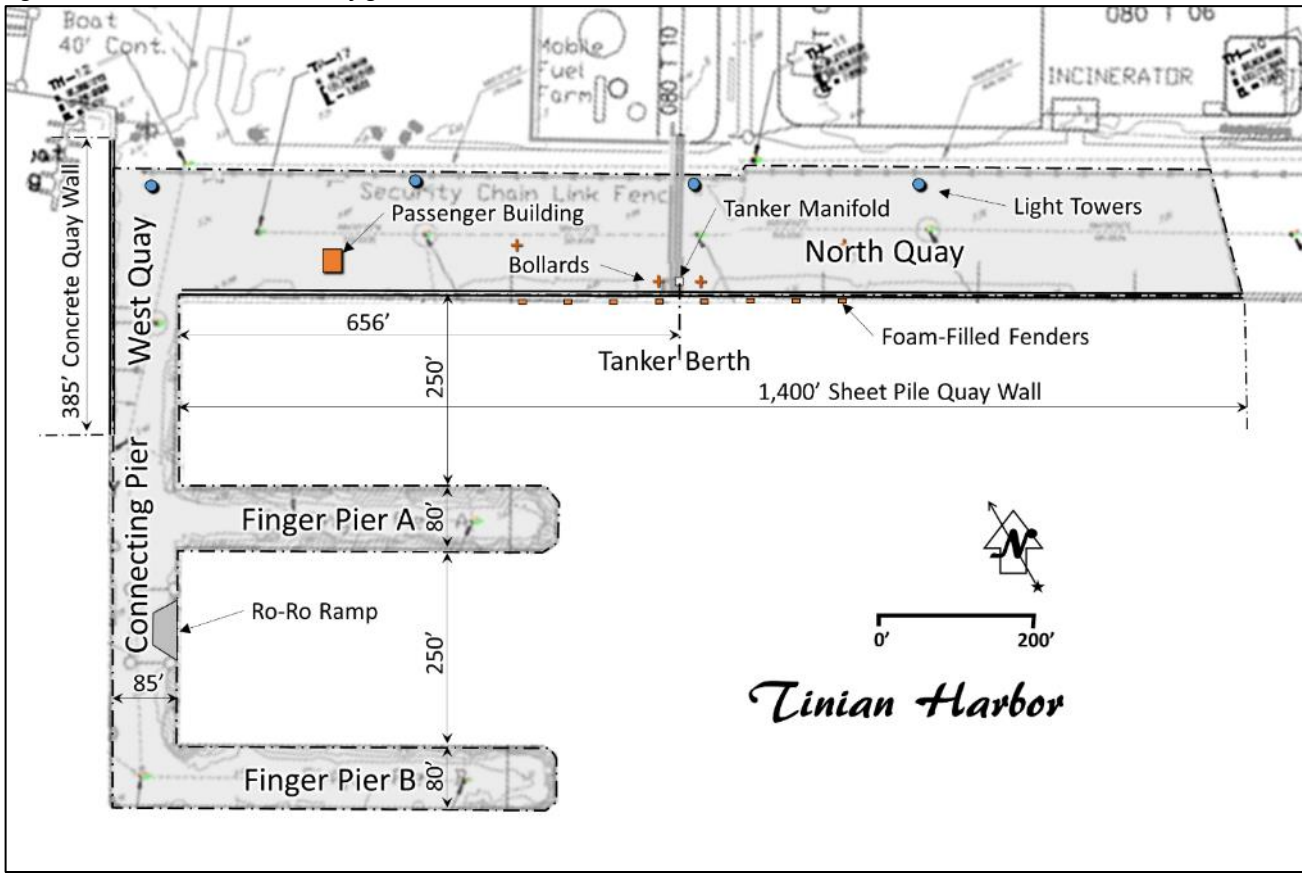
illustrates the existing commercial seaport in more detail. Dimensions of the Finger Piers and Connecting Pier shown in the figure are as originally designed. However, significant deterioration and collapse of the sheet pile walls has reduced the width and created an irregular water line.
